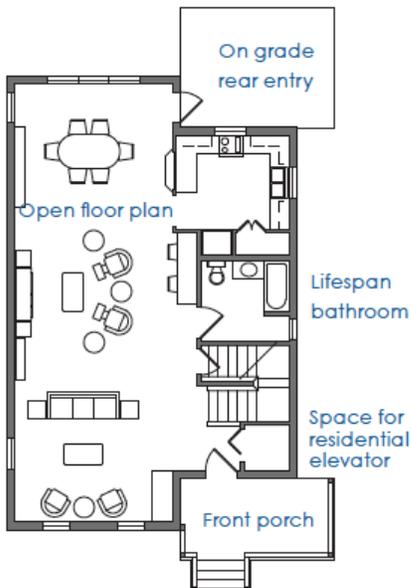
FIGURE: a VISIBLE floor plan. Note closet space easily convertible to an elevator. Living or dining areas could be reconfigured into a bedroom if necessary. credit: THE CENTER FOR INCLUSIVE DESIGN AND ENVIRONMENTAL ACCESS (IDEA)
